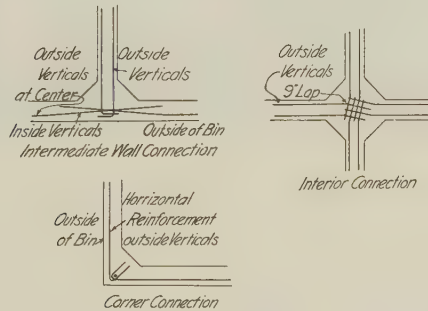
DETAILS OF REINFORCEMENT FOR RECTANGULAR BINS
